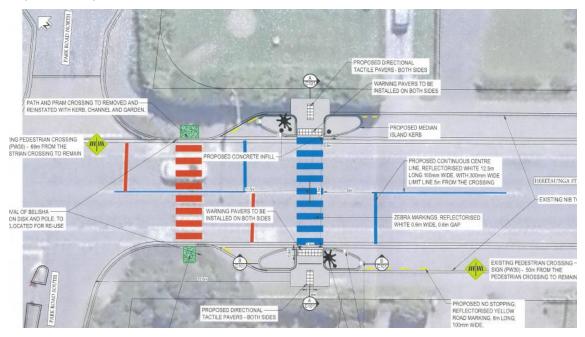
Location and plan of relocated pedestrian crossing on Heretaunga Street East near Park Road North
